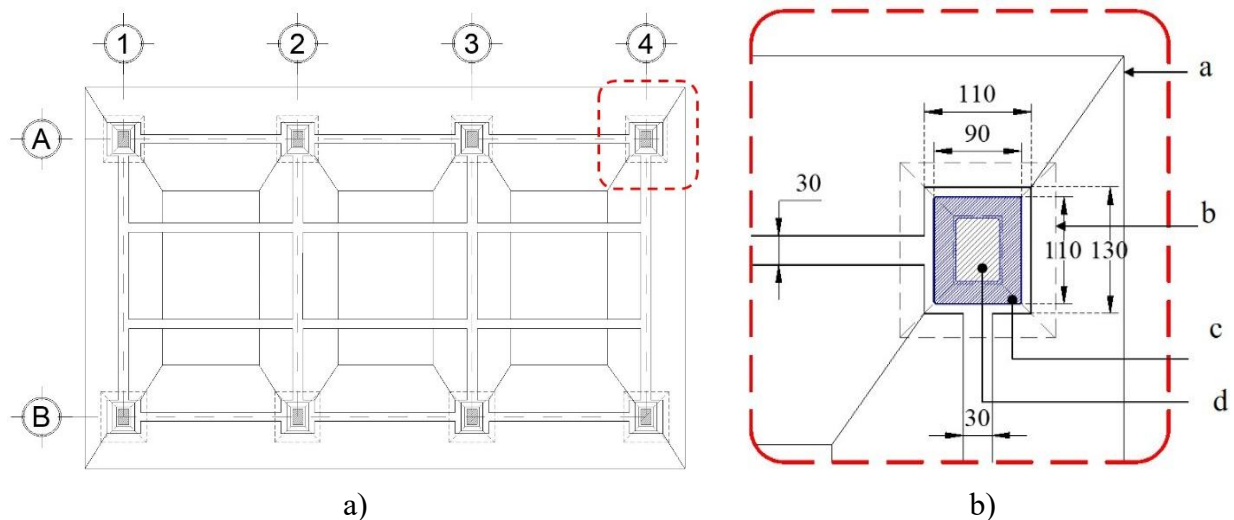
Cladding on columns and foundations; a) plan view of the clad foundation; b) plan view of the cladding on the existing reinforced concrete footing and column; where: a = foundation reinforcement based on continuous footings, b = projection of existing isolated footing, c = reinforced concrete cladding on existing column, d = existing reinforced concrete column.
